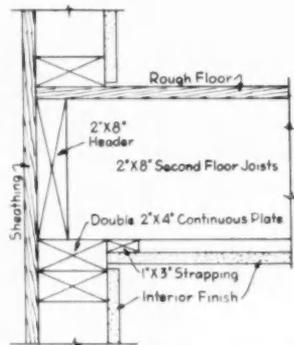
Typical section through exterior wall where dry wall construction is used. Note position of 1x3 starter piece strapping
